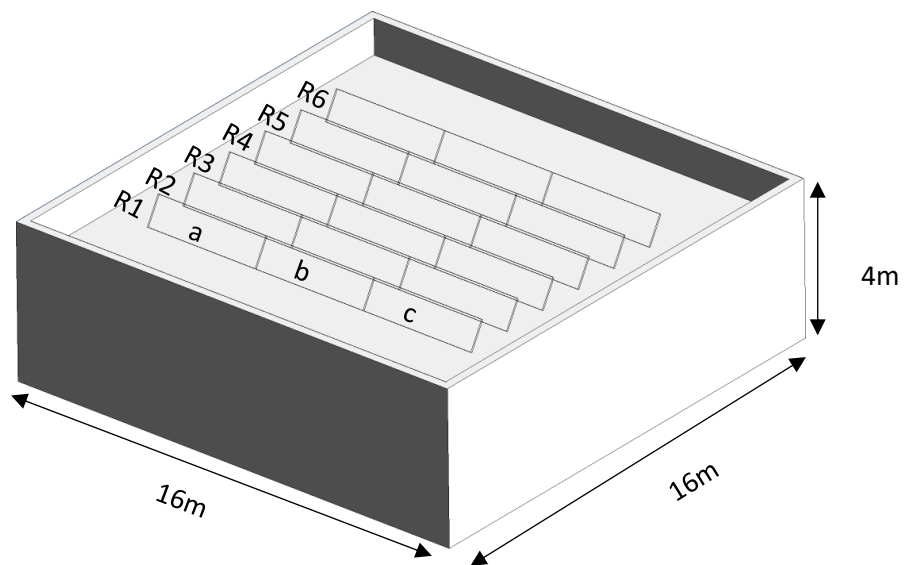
Schematic view of roof mounted solar arrays with parapets (Not drawn scale)
